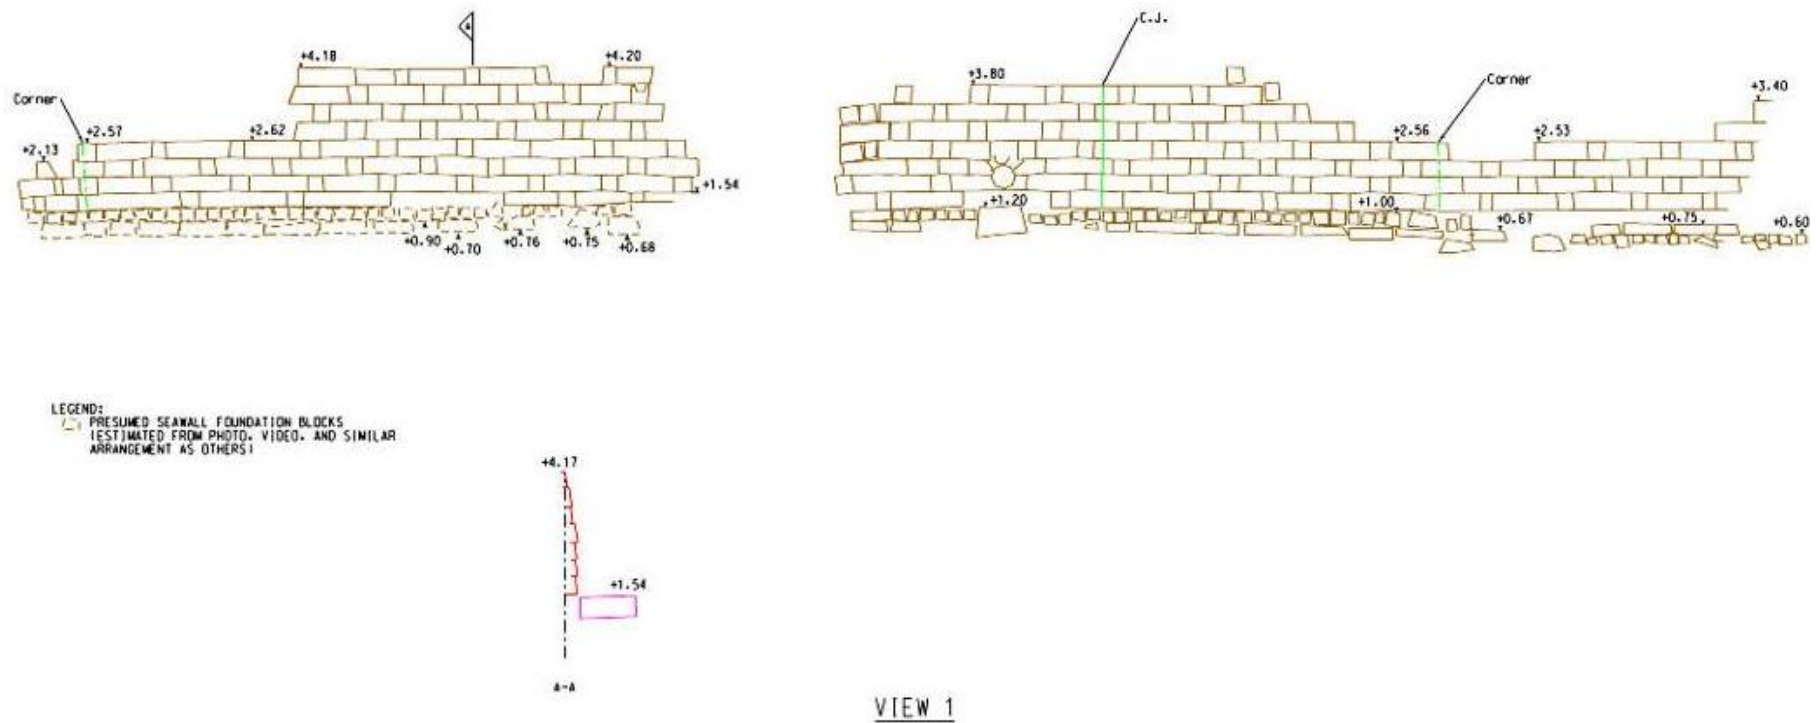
Surveyors drawing of the North facing elevation of seawall fragment and foundation. (901\_C\_ADM\_SUR\_C80\_004C); green line is location of cross section shown below.
